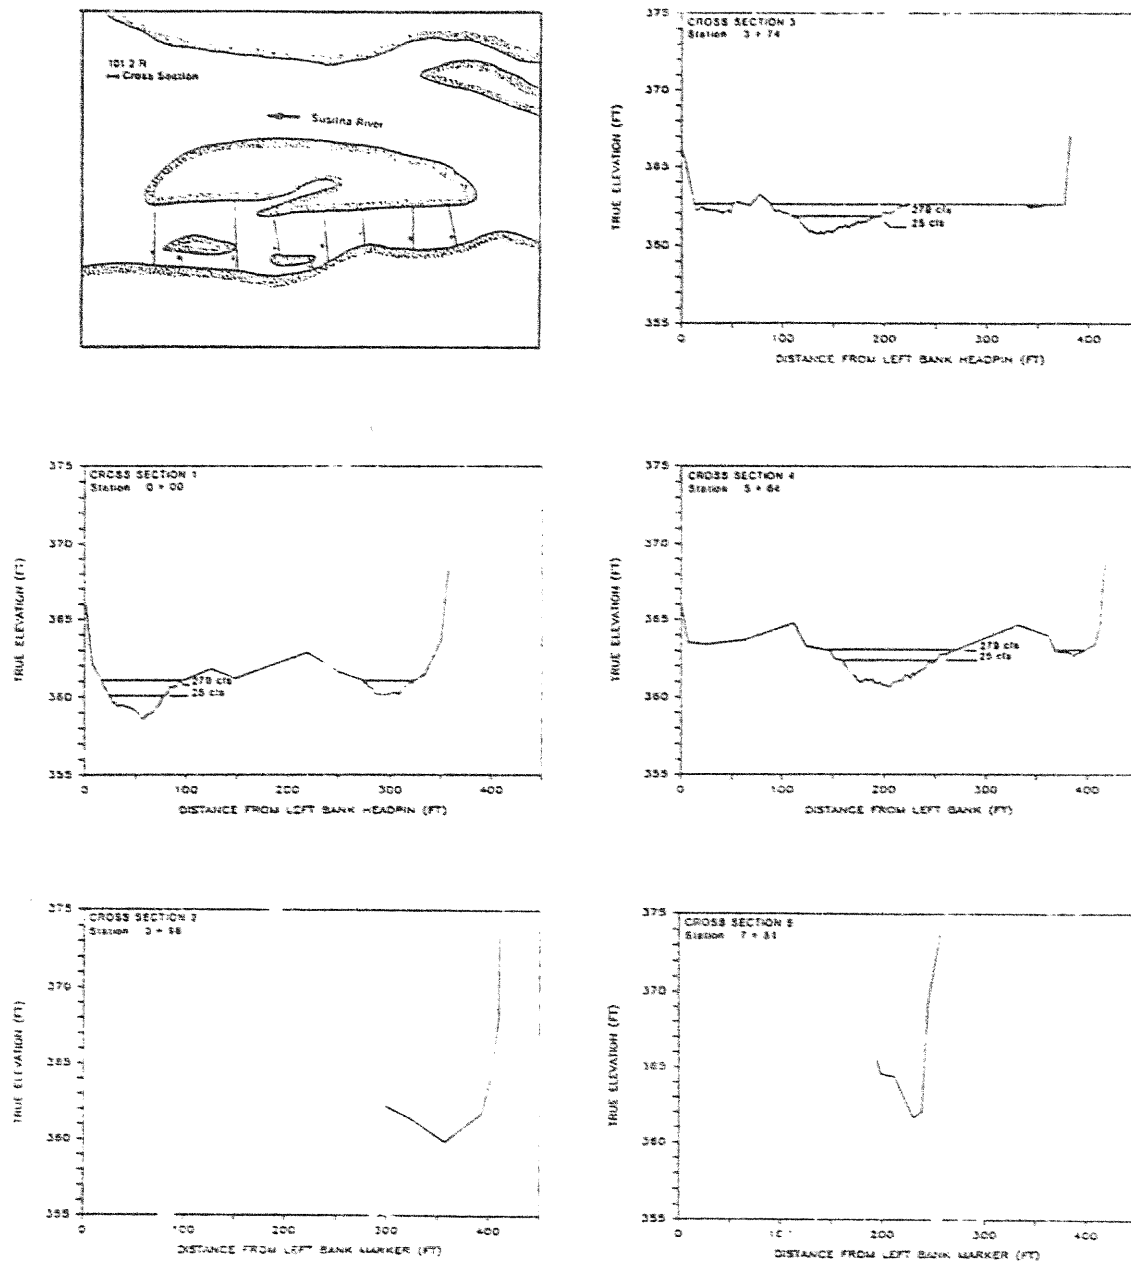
Cross sections for 101.2R study site depicting water surface elevations at calibration discharges of 25 and 279 cfs.
